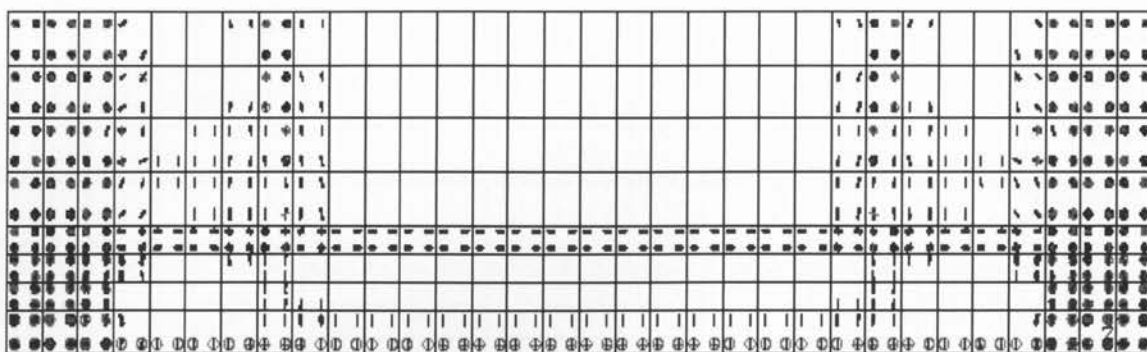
Crack pattern of 4 m fix-fix wall in three years
